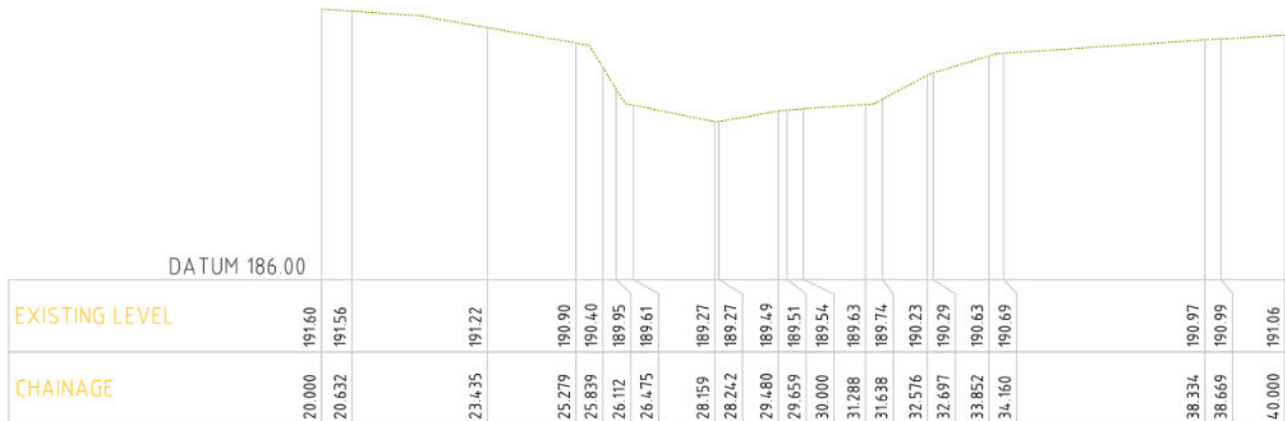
Eight Mile Creek proposed crossing location creek cross section.
